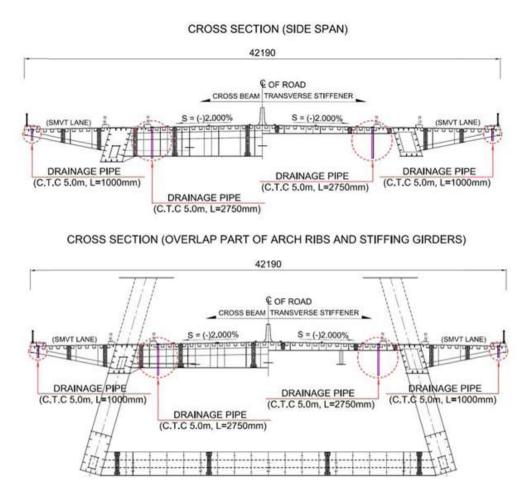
Current Drainage Plan of the Kewatkhali Main Bridge (1)
